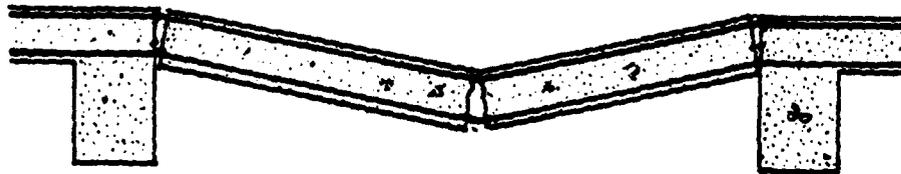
Plastic Tensile Membrane in Restrained Reinforced Concrete Slabs
